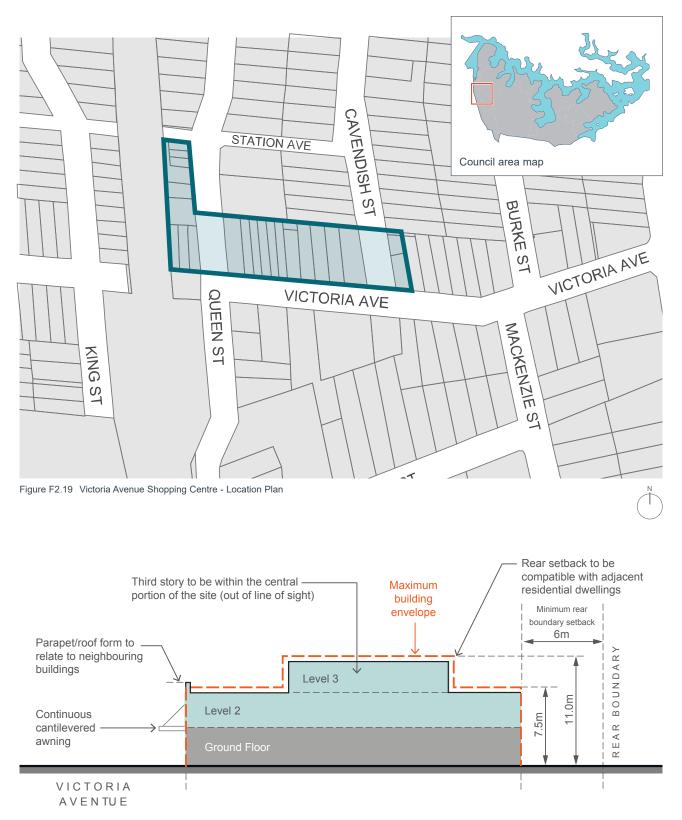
Victoria Avenue Shopping Centre - Maximum Building Envelope Section
